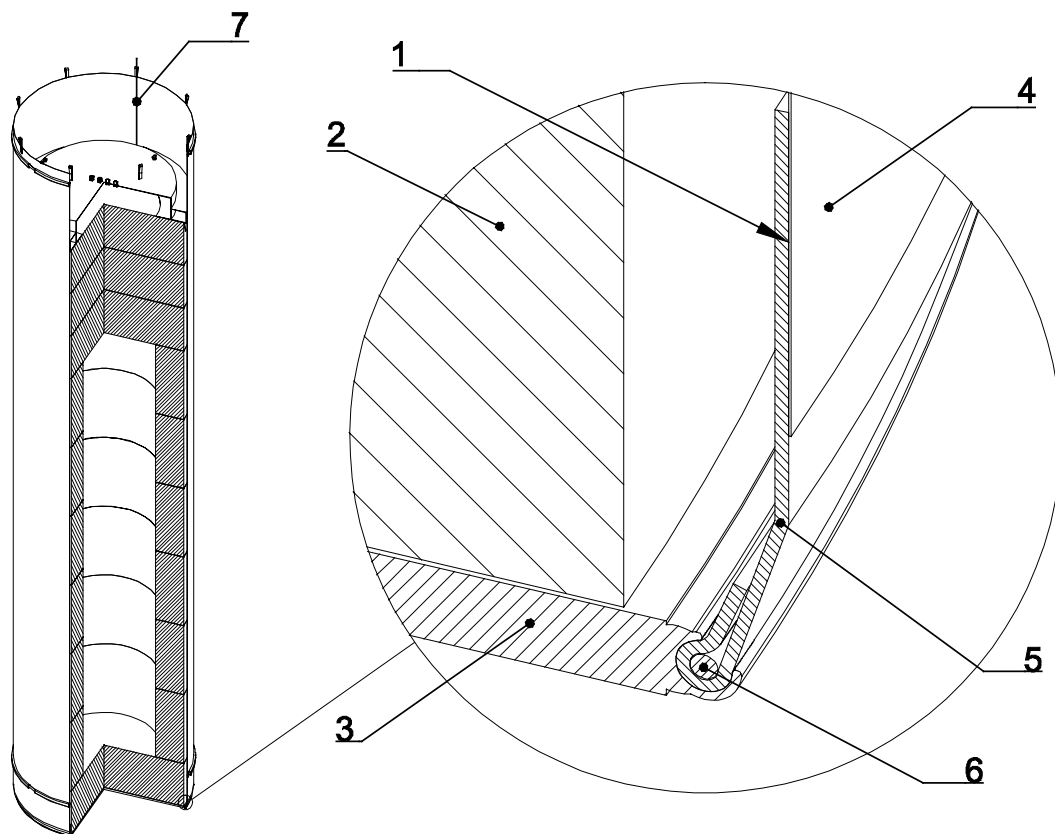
View of lower part of sheet where a rubber seal is glued to the sheet: 1) Polyurethane polymer glue. 2) Buffer block. 3) Bottom plate. 4) Protective sheet. 5) Rubber Seal. 6) Rubber O-ring. 7) O-ring extension.
